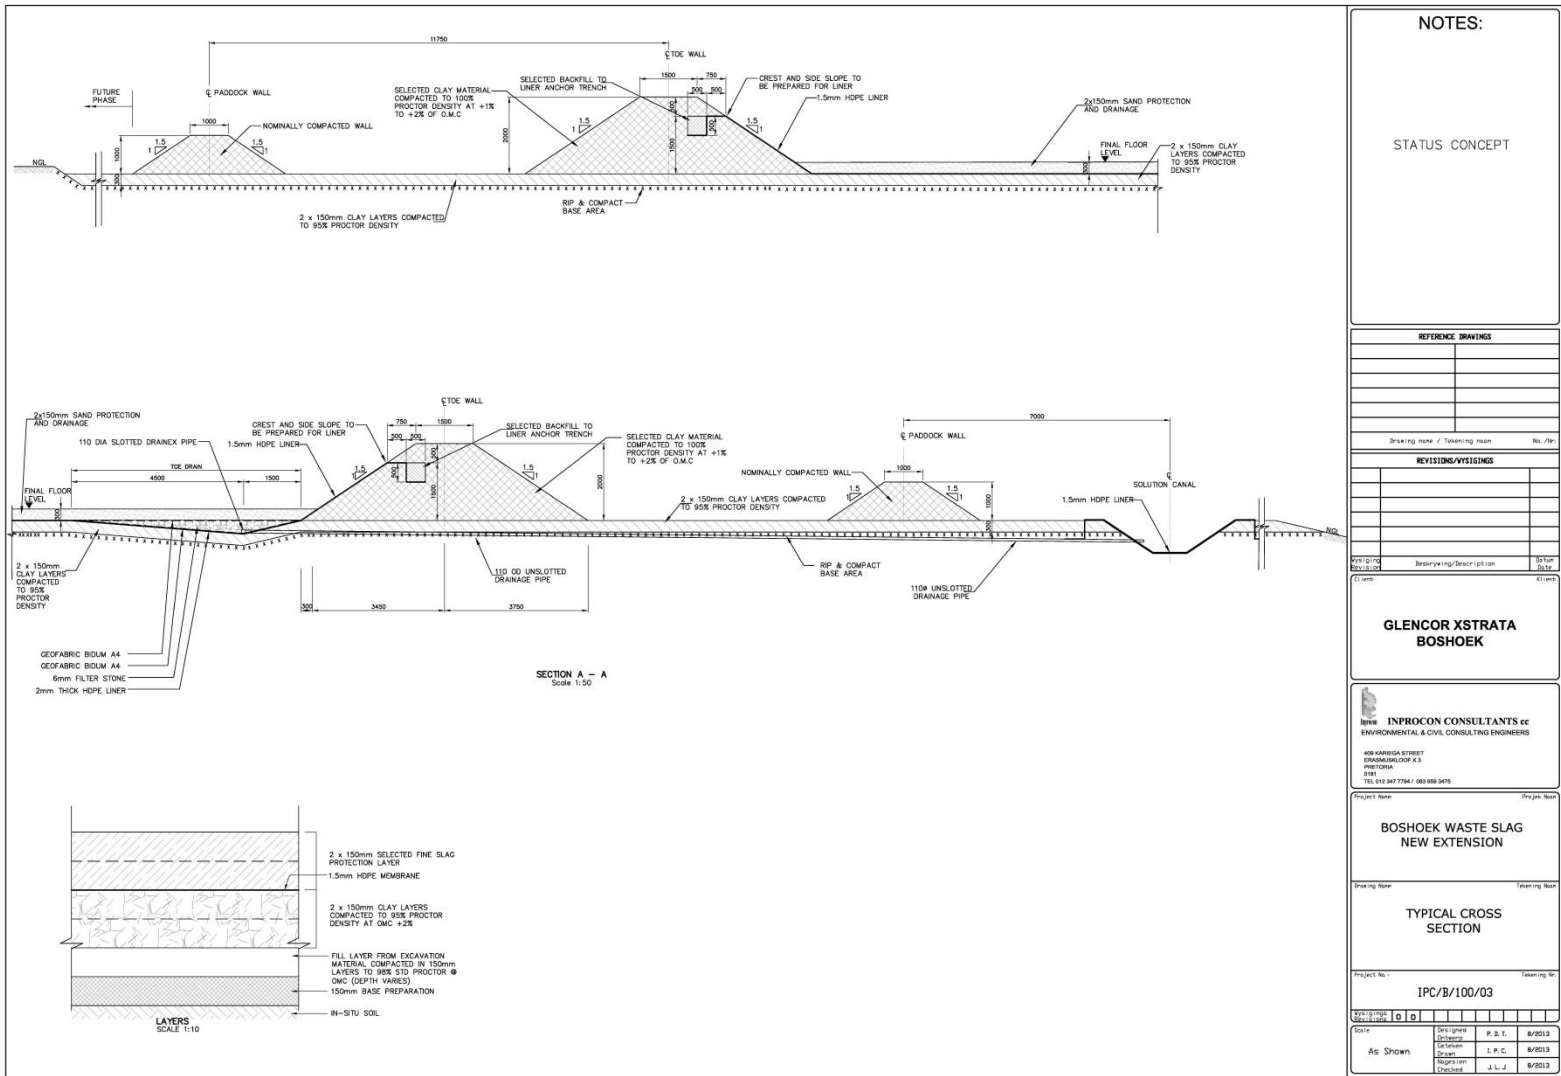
(a): Details for New Slag Dump and Slag Dump PCD Liner
